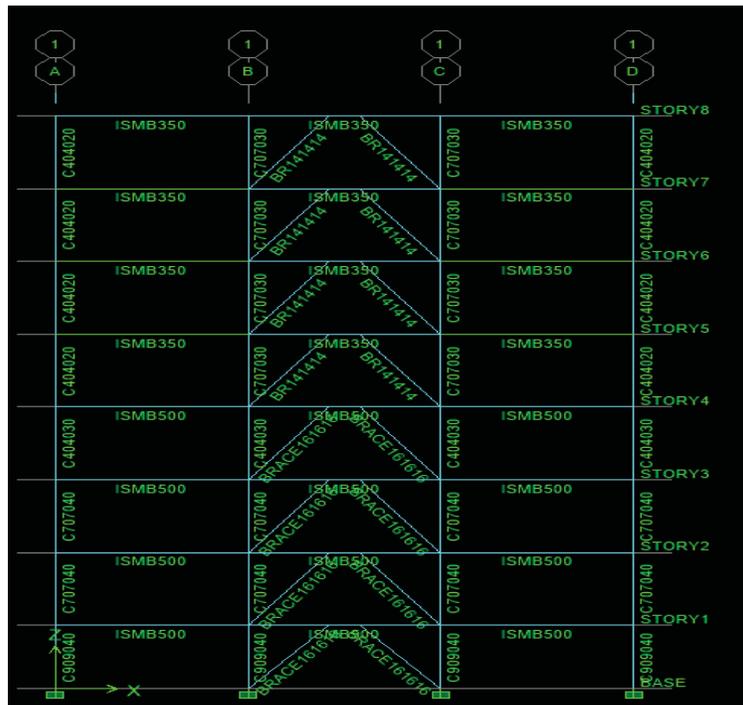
8 story structures with Eccentric inverted _V bracing system
